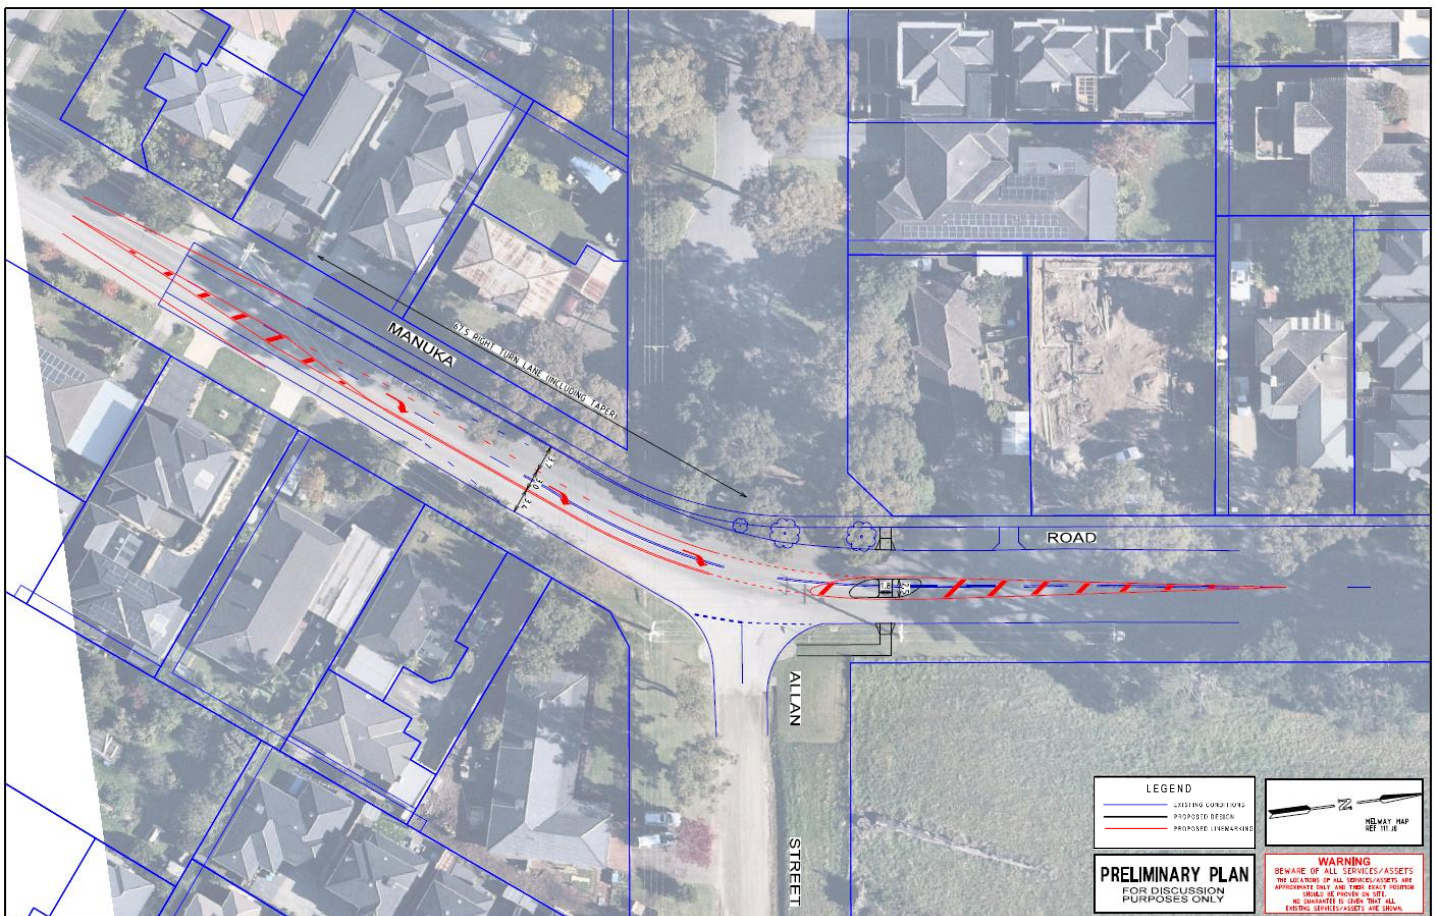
B – Manuka Road / Allan Street Right Turn Lane Treatment
